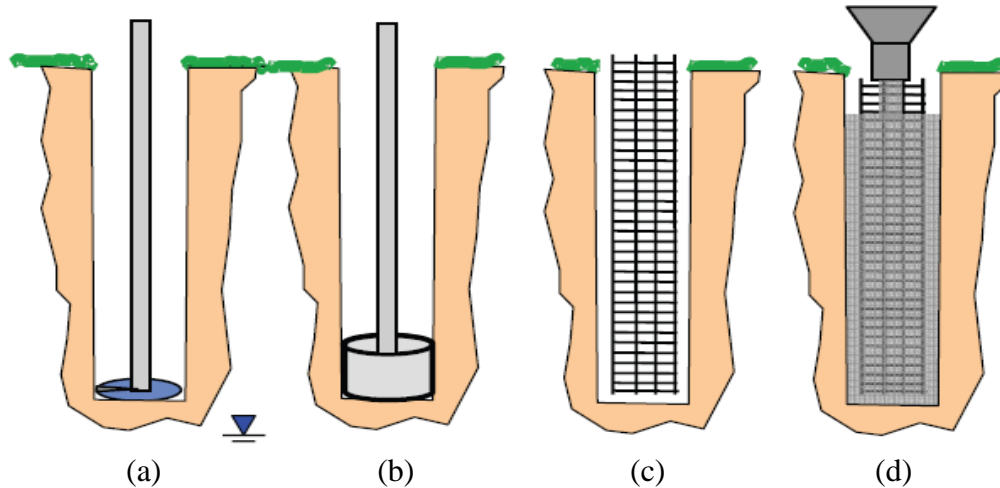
Dry method of construction: (a) drill the hole; (b) clean the base; (c) place reinforcement; and (d) place concrete (Brown et al. 2010)
